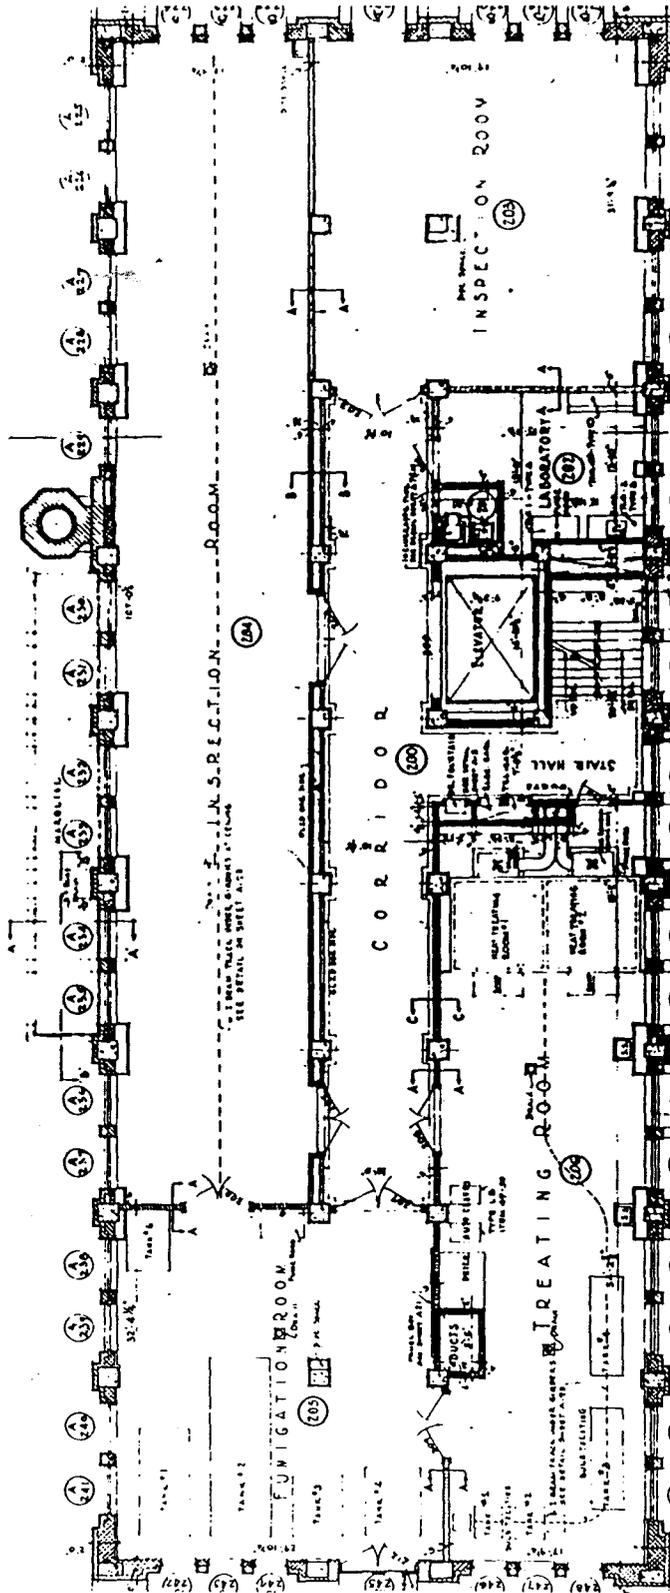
(Hoboken 206). Floor plan of the second floor.
